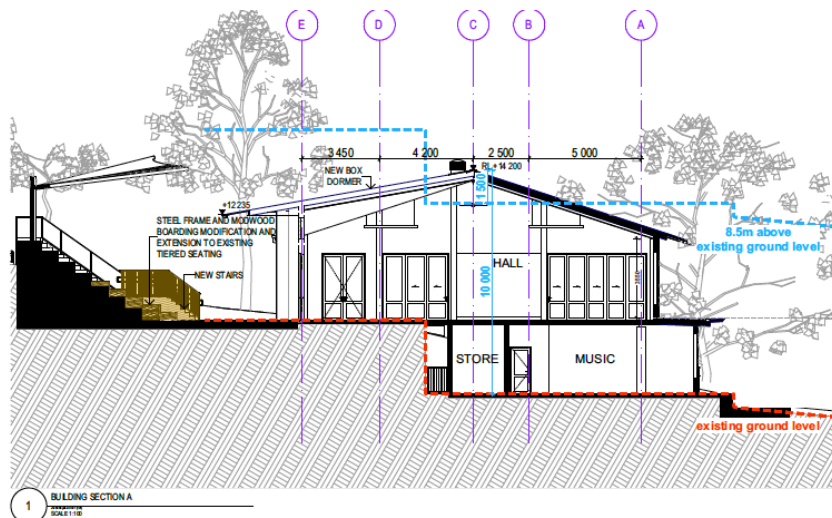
Extract of Section depicting maximum height of 9.98m and sitting below ridge height of existing structure
